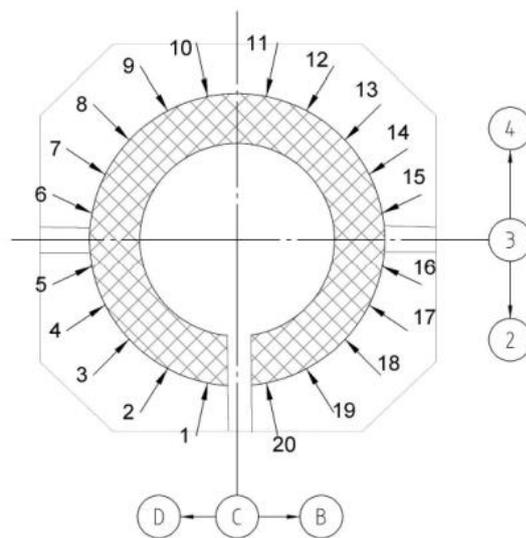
Test Scheme for inspecting concrete strength in reactor cavity wall at elevation -4.90m to +1.950m.
